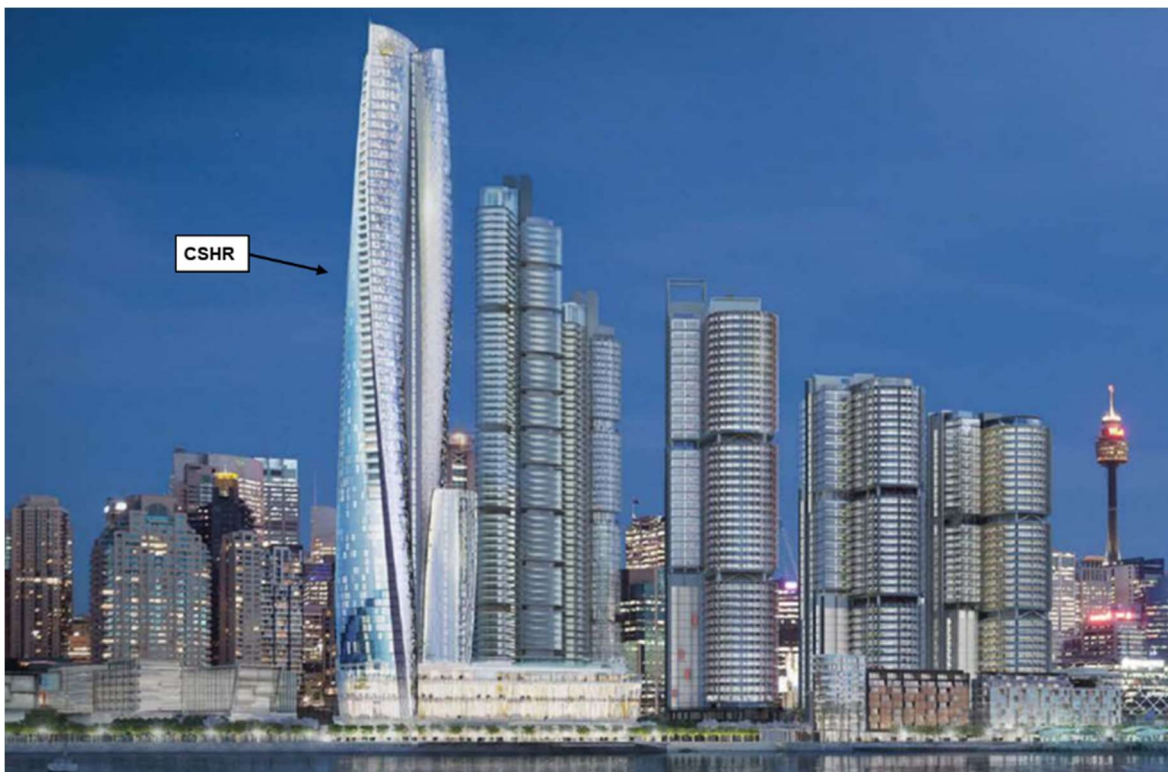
| Perspective looking east towards the CSHR tower (Source: SSD 6957)
